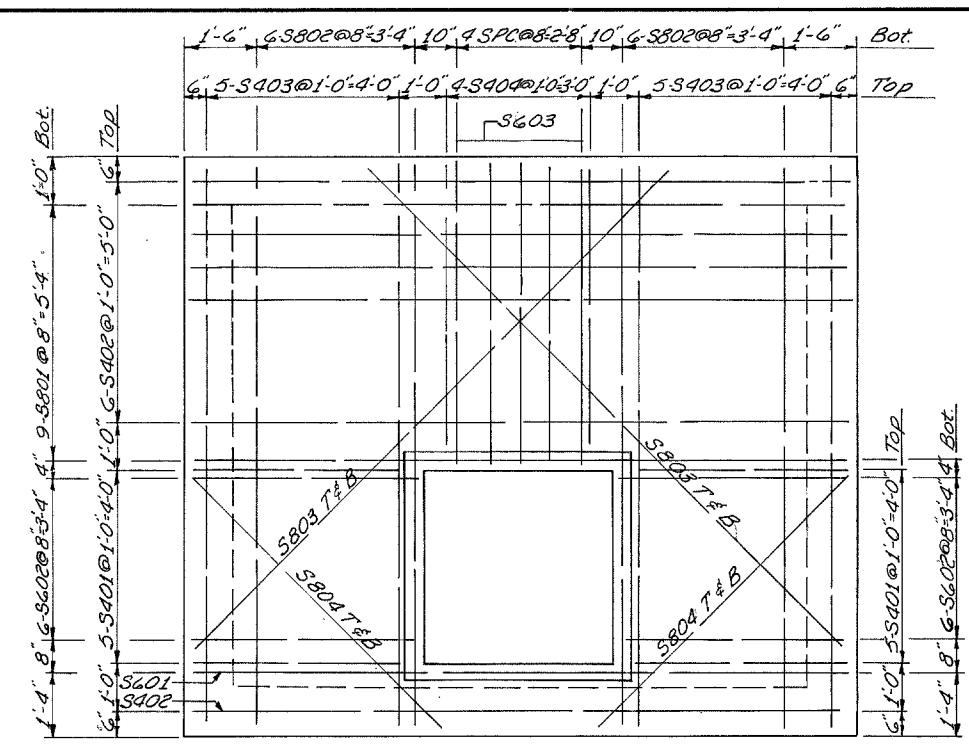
' 30' BEND ANCHOR STA. 14+70 & 15+39.43
